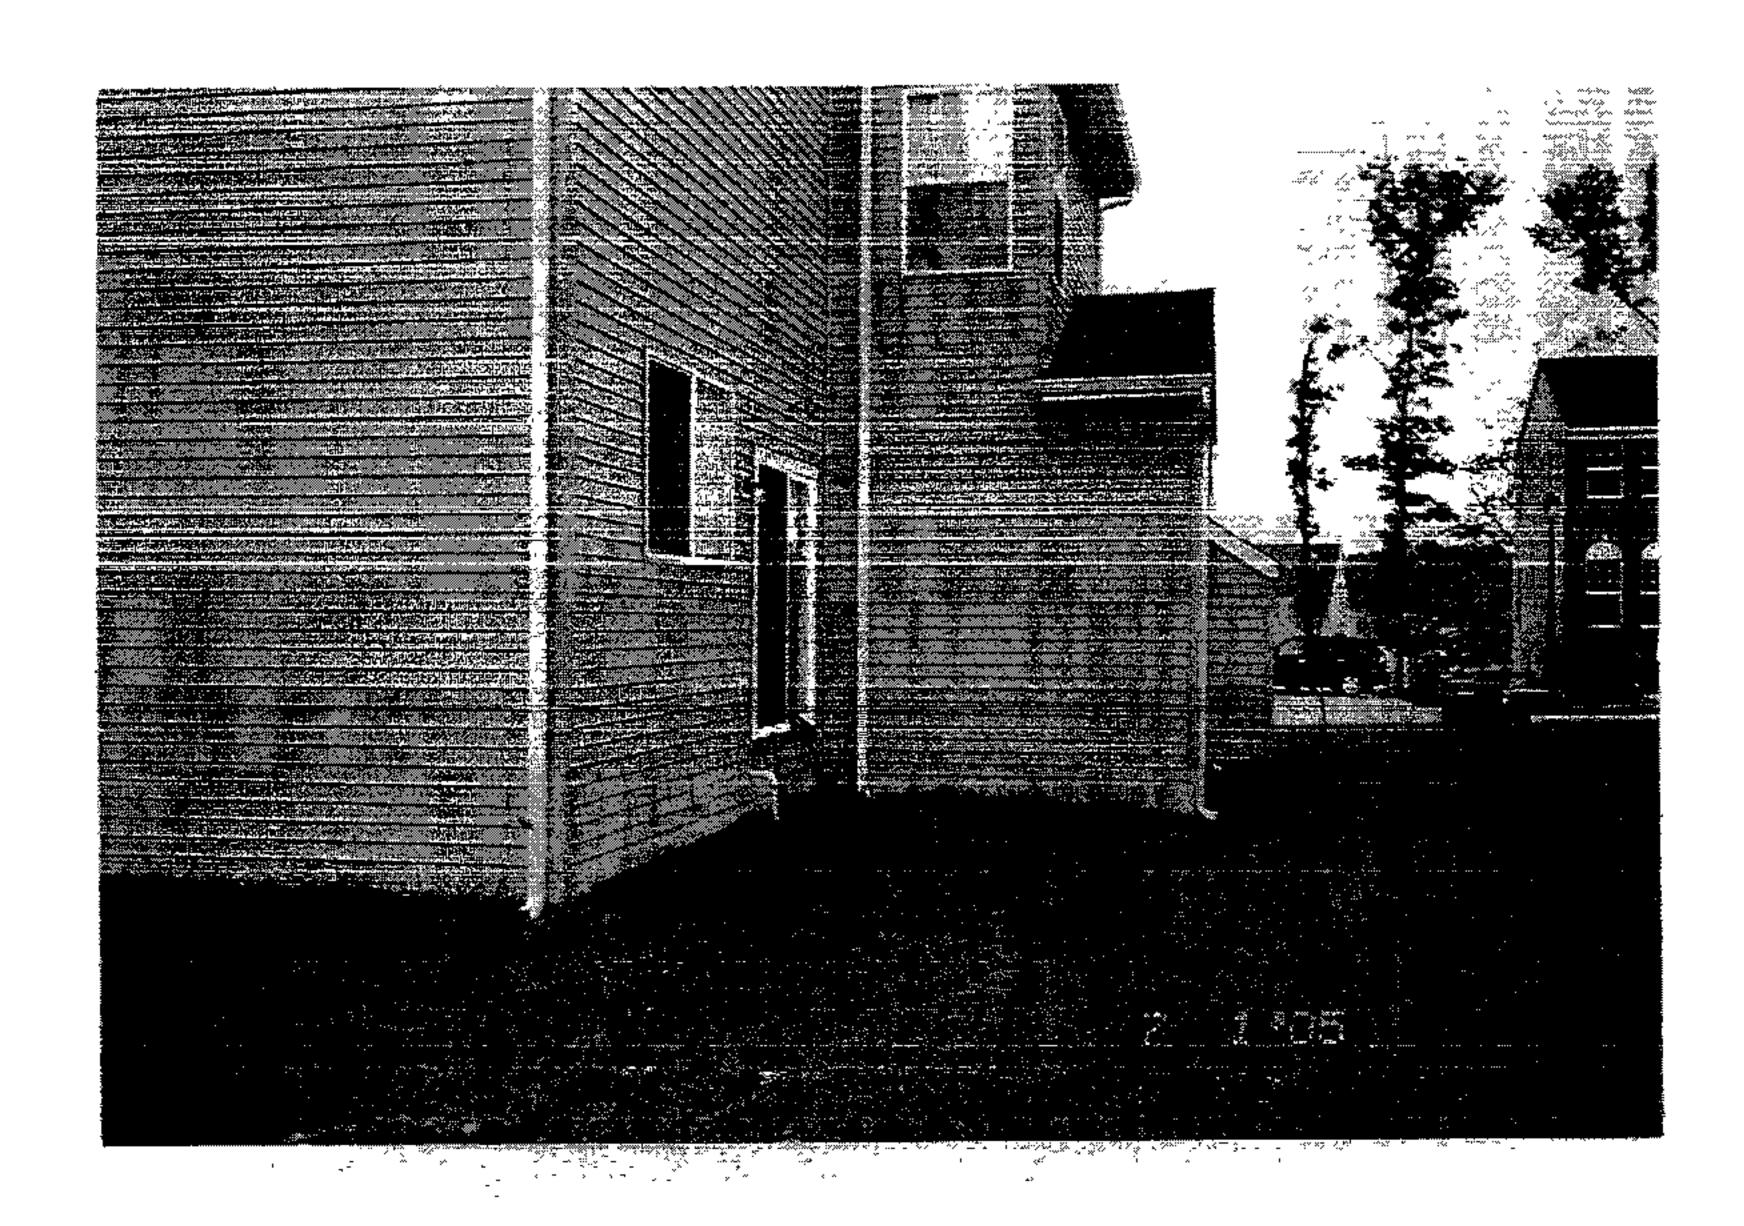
An up-close view of the area where the planned deck will be located. This clearly shows the access to the deck via the sliding kitchen door.
